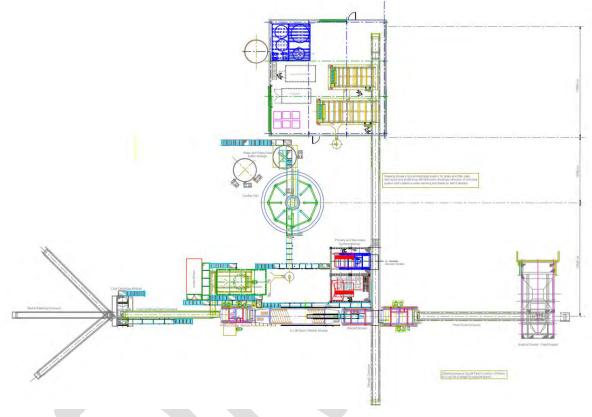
RCC on-site processing plant (V2-S03/0005)
